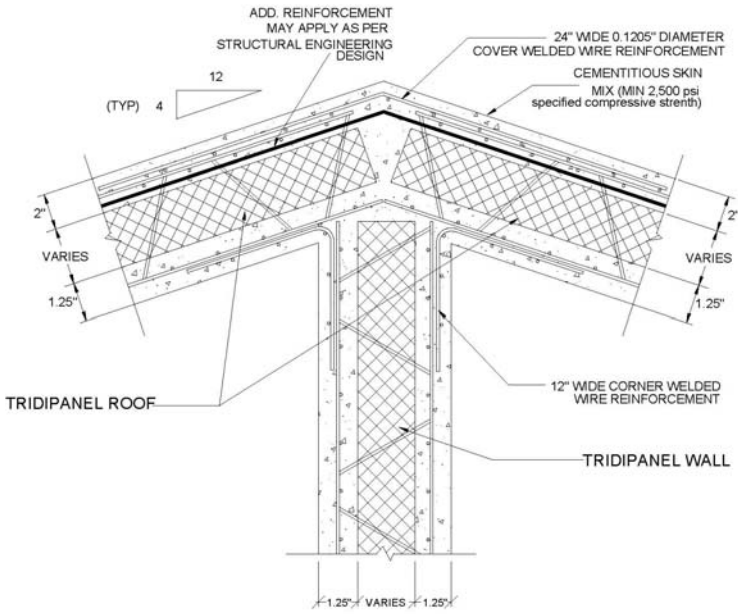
DETAIL, WALL AT ROOF RIDGE CONNECTION
